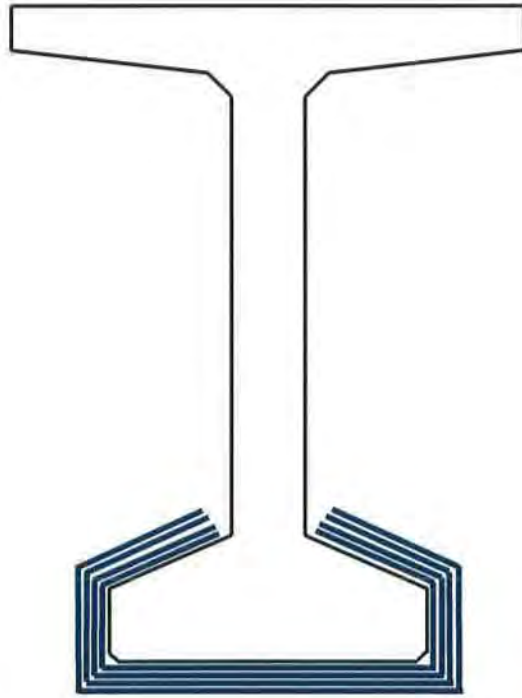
Detail of the Cross-sectional FRP Configuration at Section A
